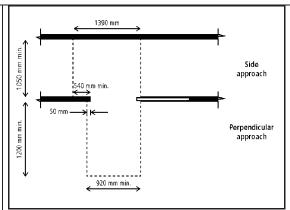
C Clear floor surfaces Sliding door
